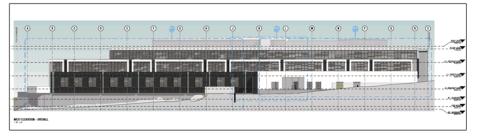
North-western and part of south-western elevation in plan view, illustrating the varied setbacks particularly to the north and west (source: SPA)
